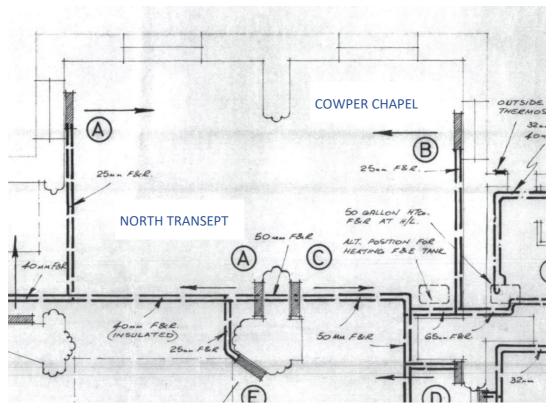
Extract from 1978 plan showing underfloor pipework routes that have resulted in relaid areas of floor.
